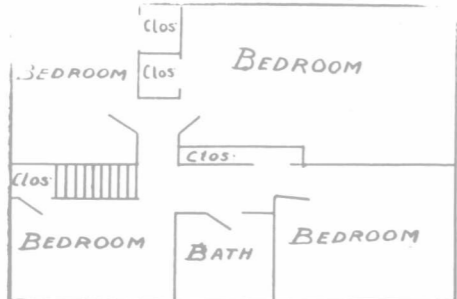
In the above plan, long closet door should be more to the right to come within the bedroom. A slight mistake was made in the cut.
